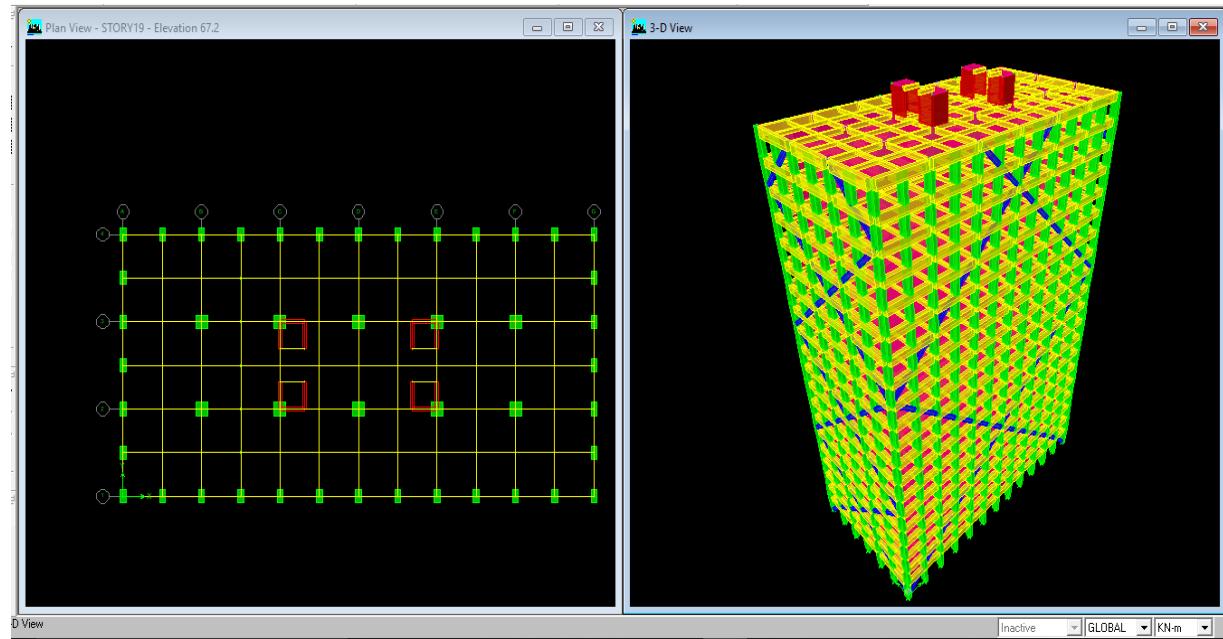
Plan view and 3-D view of 20 storied Braced Tube structure building
